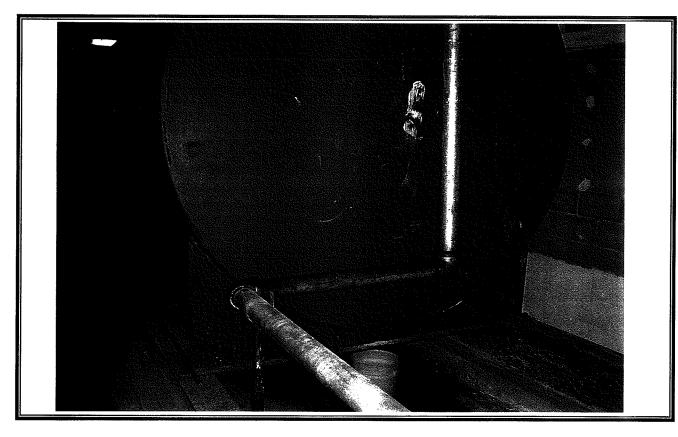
Photo Date 11/21/06 View of the steel 6,000 gallon fuel oil tank and supports at Midtown Tower Building. The product gauge indicated that the tank contained 1,300 gallons of fuel oil. The steel supports to the tank and the steel product lines from the tank are evident.
